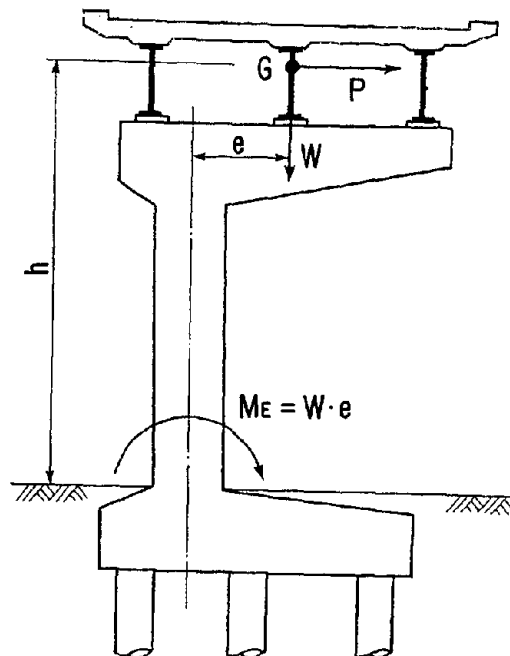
C-Shaped Reinforced Concrete Bridge Pier Subjected to Eccentric Loading
